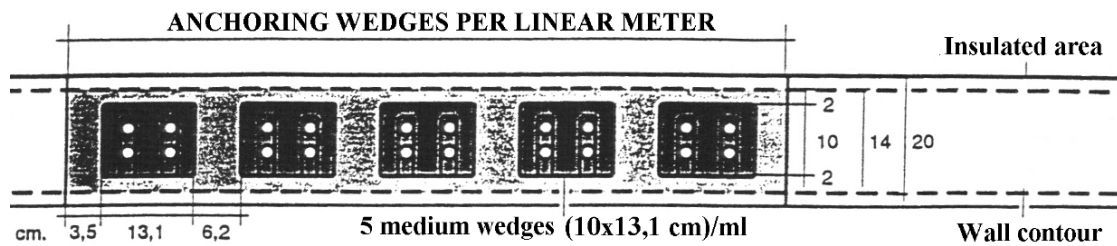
Right arrangement of anchoring wedges for a 14 cm wall thickness.
